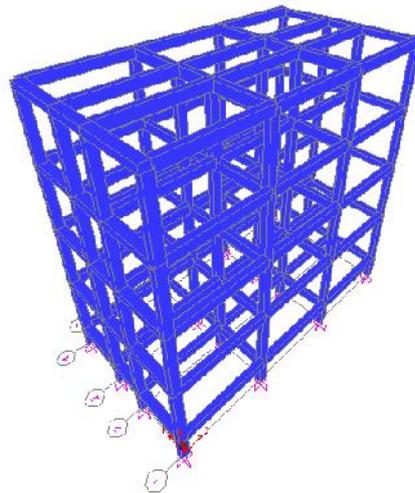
3D view of fixed base building (G+3) in SAP 2000
